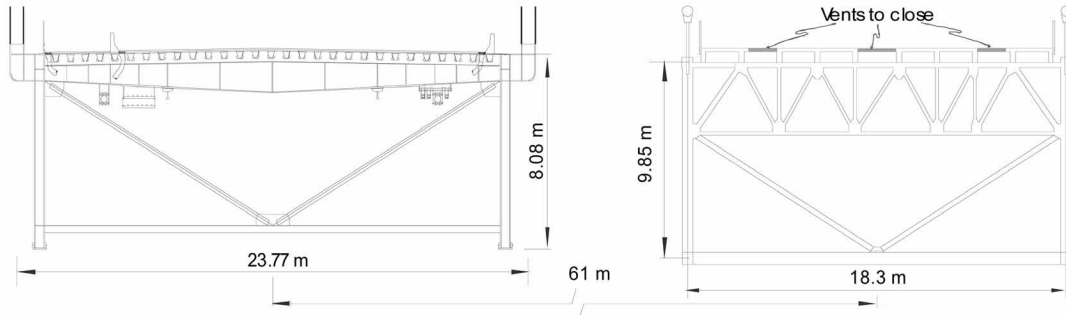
Truss decks of the Parallel Tacoma Bridges (courtesy of Parsons/HNTB/WSDOT).
